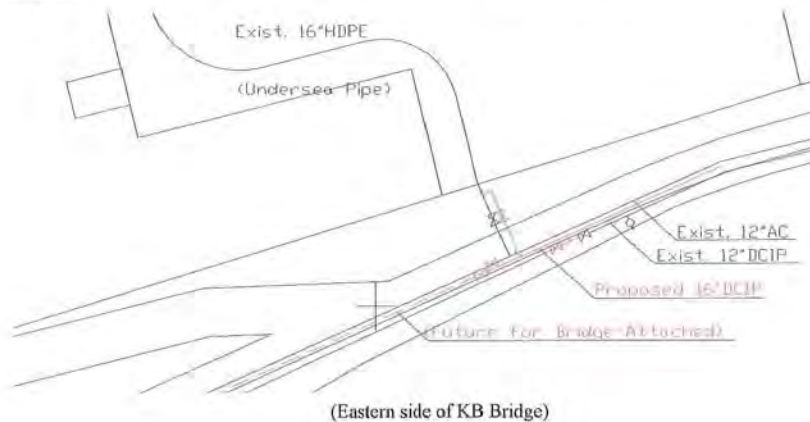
Proposed Connections to Existing Undersea Pipeline around KB Bridge
